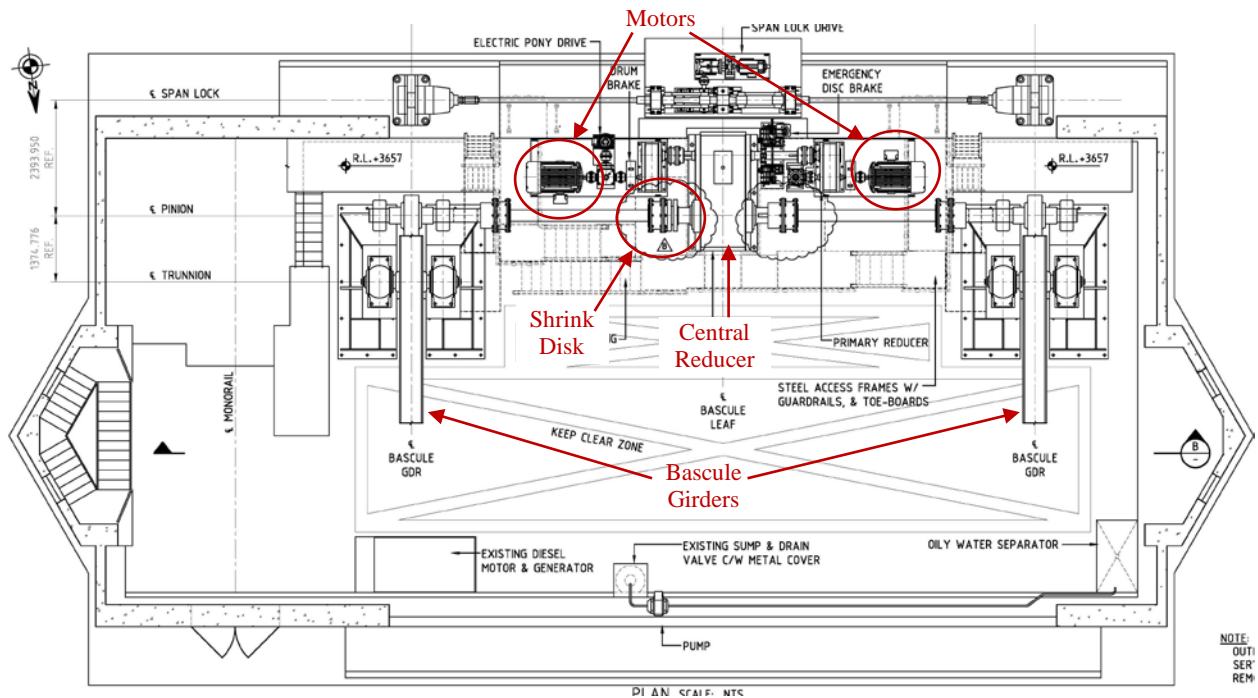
New configuration of span drive machinery with shrink disk assembly on central reducer output shaft.
